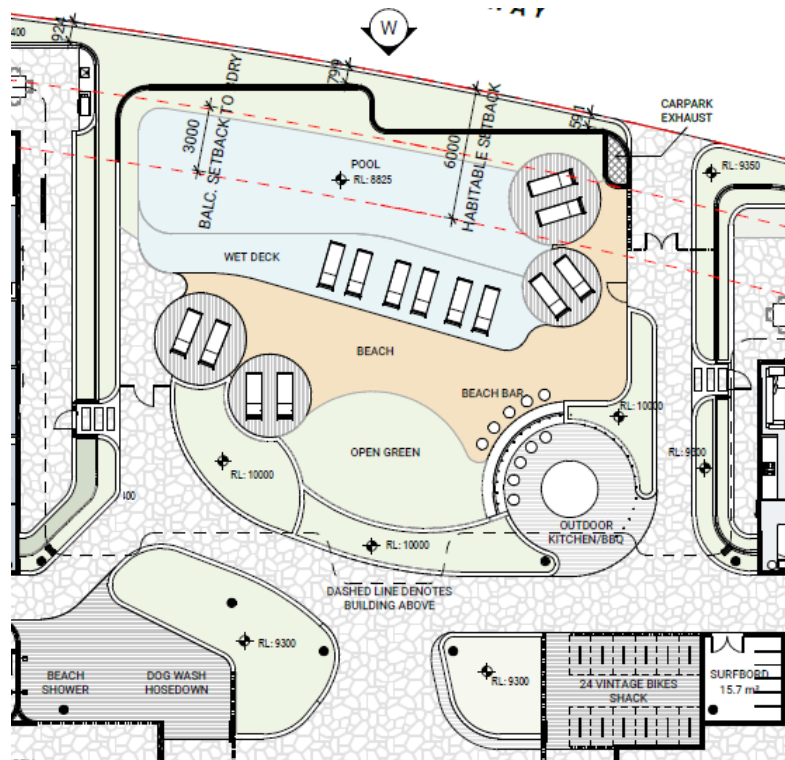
Excerpt from Drawing No. DA100 - Da Plans by plus architecture June 2021
